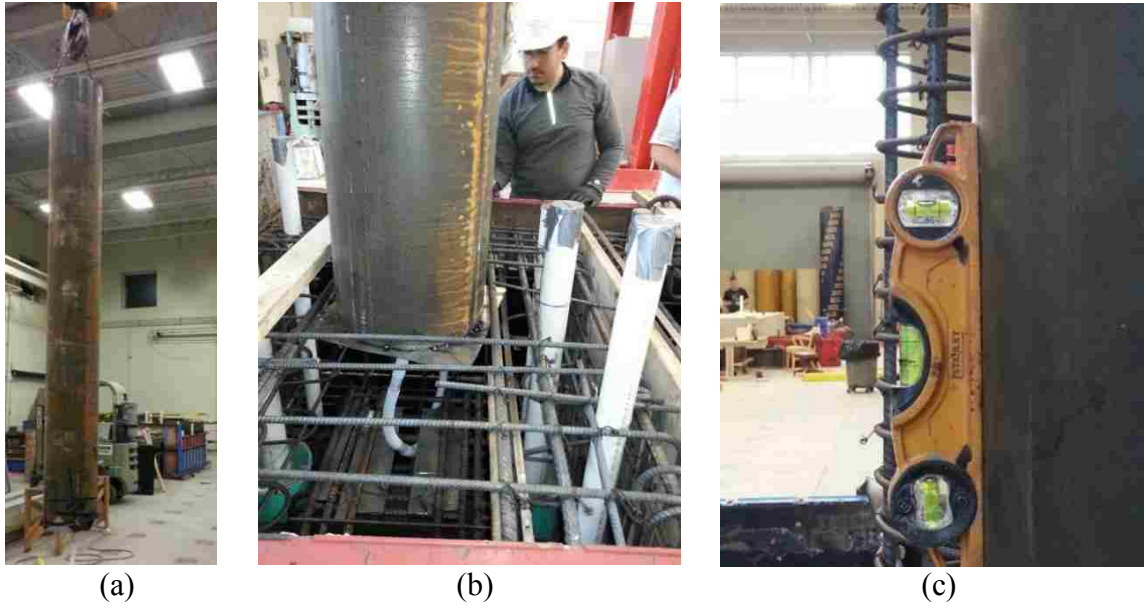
Install the steel tube into the footing: (a) moving the steel tube, (b) putting the steel tube into the footing, (c) verticality check of the steel tube
